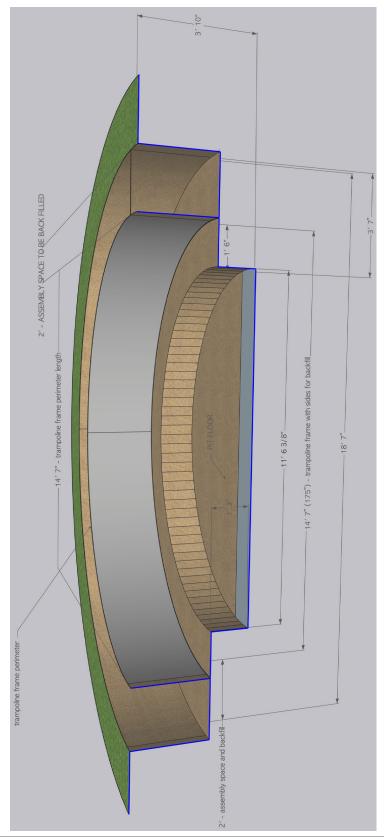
PIT DIMENSIONS - TOP VIEW
